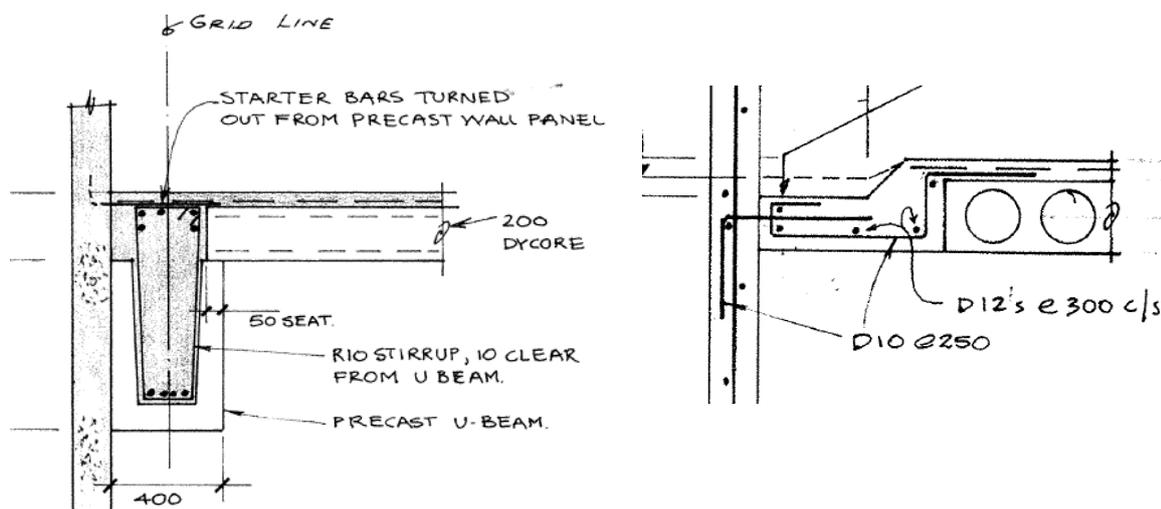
Hollowcore slab details. Connection to walls perpendicular (left) and parallel (right) to span direction of precast units
